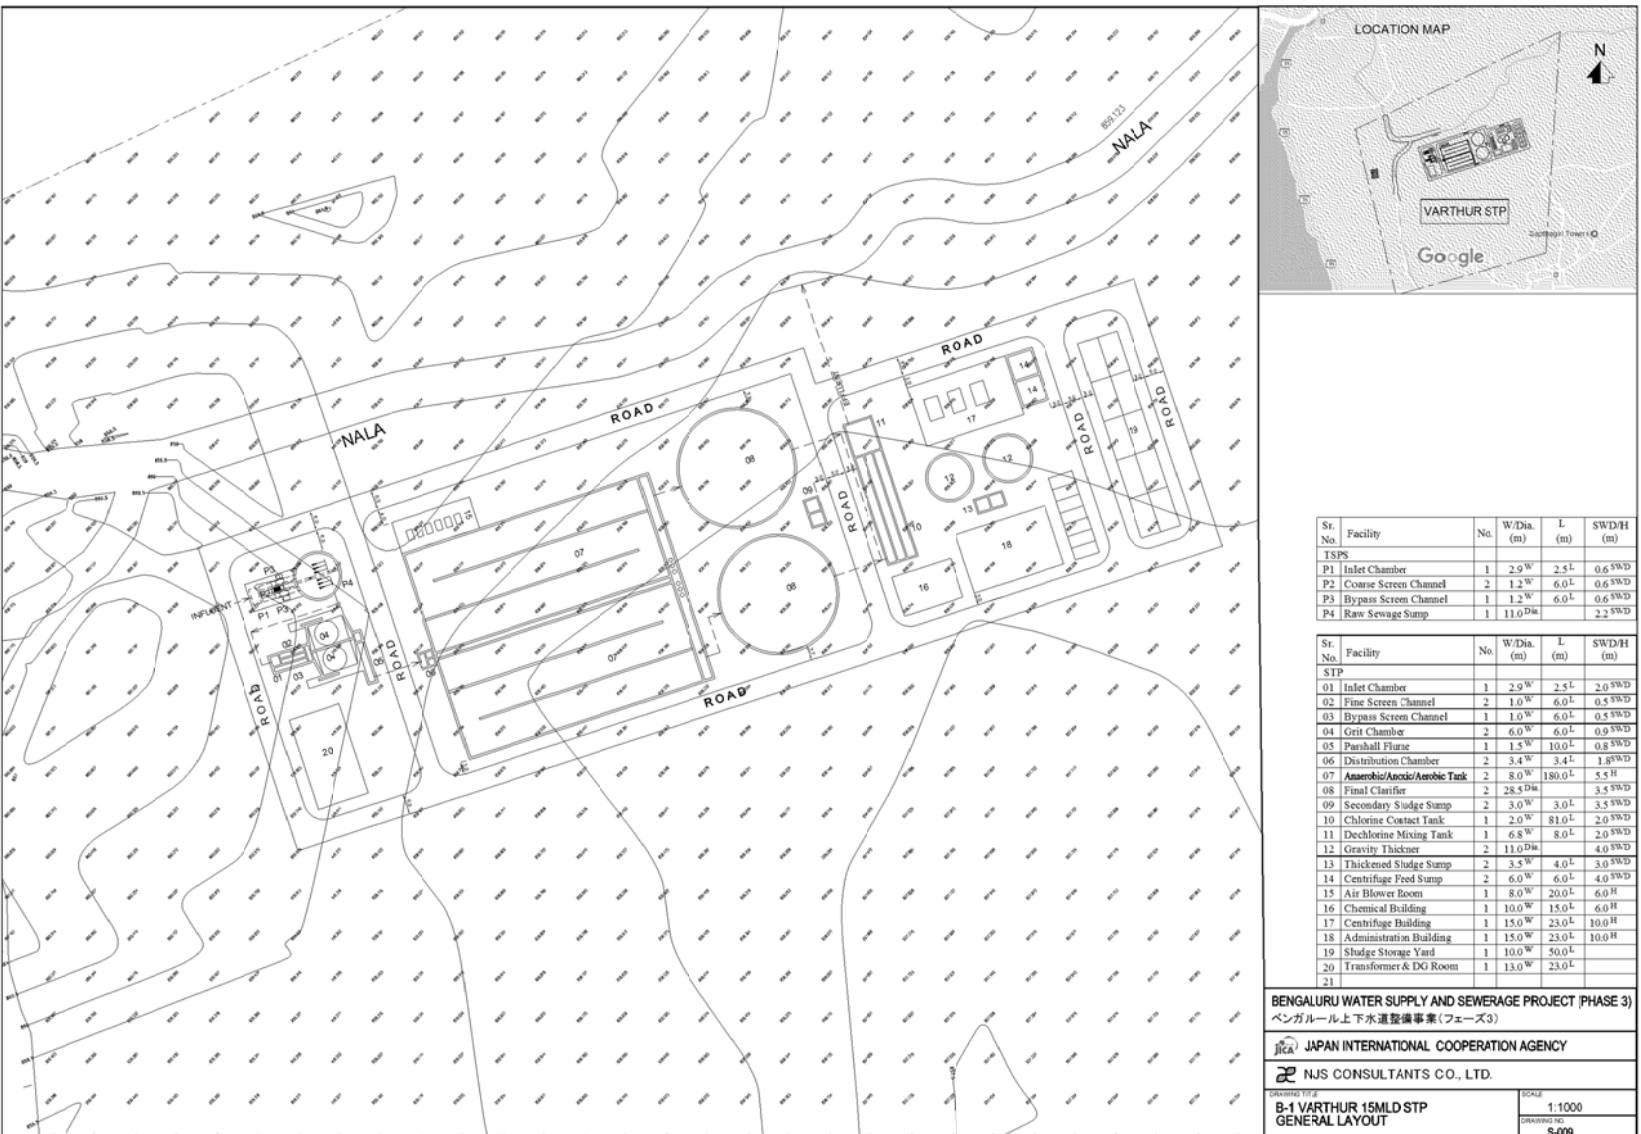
Layout plan of Varthur (Stage V) STP
